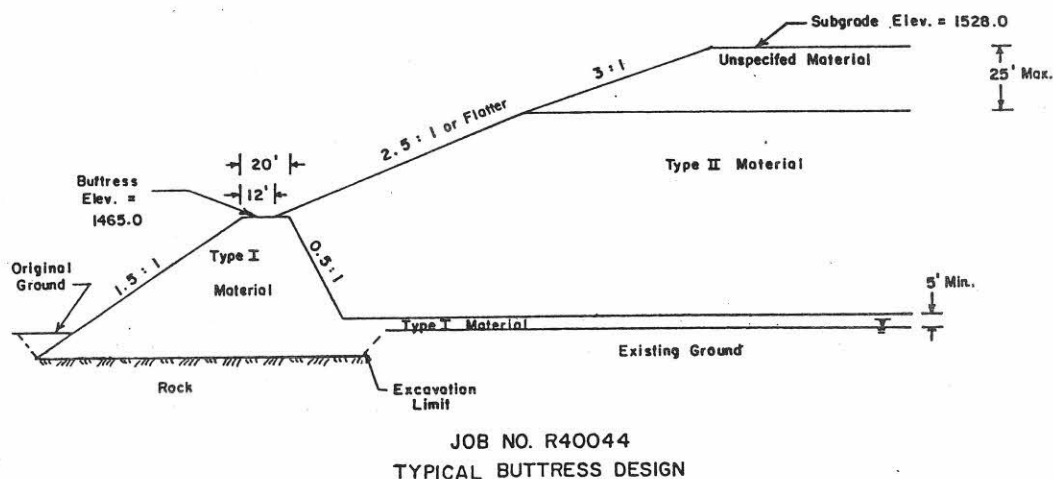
Typical section from the construction plans illustrating the design criteria adapted for the buttress at STOP 4.
